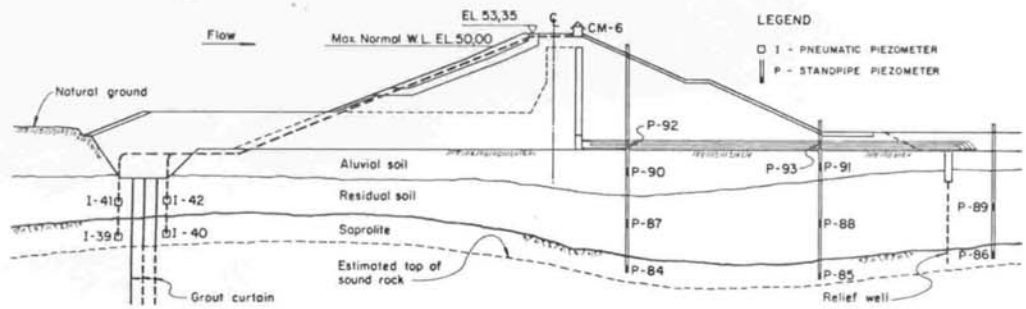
TYPICAL INSTRUMENTATION ON THE RIGHT ABUTMENT
